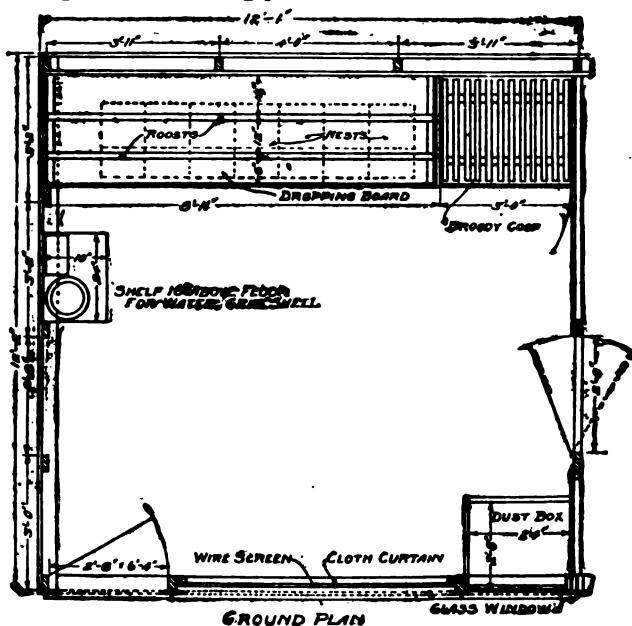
Floor plan of the Cornell poultry house with pens 12 feet square, showing size and location of the interior fixtures and timbers
